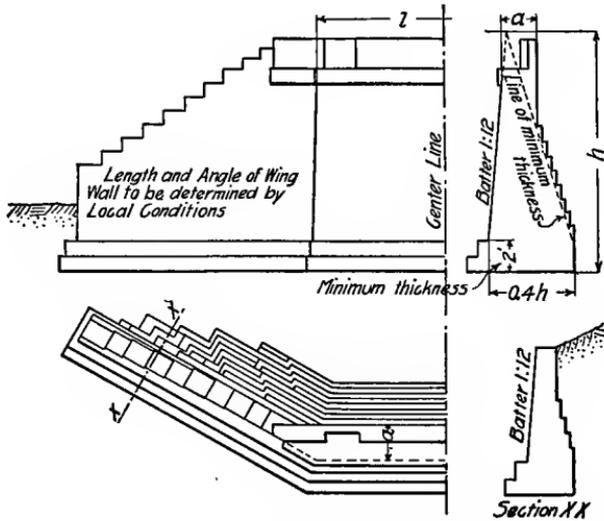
WING ABUTMENT FOR HIGHWAY AND ELECTRIC RAILWAY BRIDGES.
